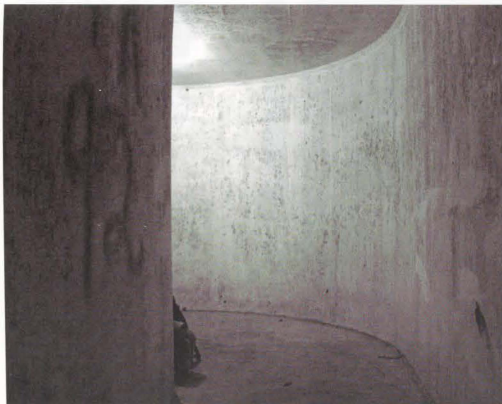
(Above). At the first turn in the west entry tunnel the high quality of the 1941-1943 construction is easily seen. The chamfer at the junction between ceiling and walls is clearly evident again in this photo.
